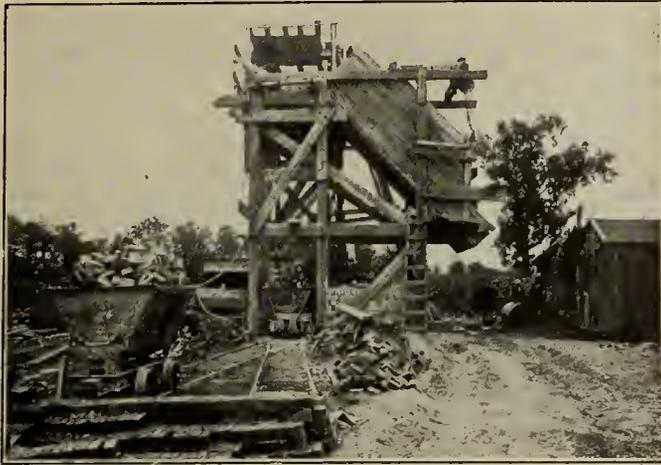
Head Works at Drop Manhole Seventy-two Feet to Invert, Cadorna Avenue Tunnel Sewer.
